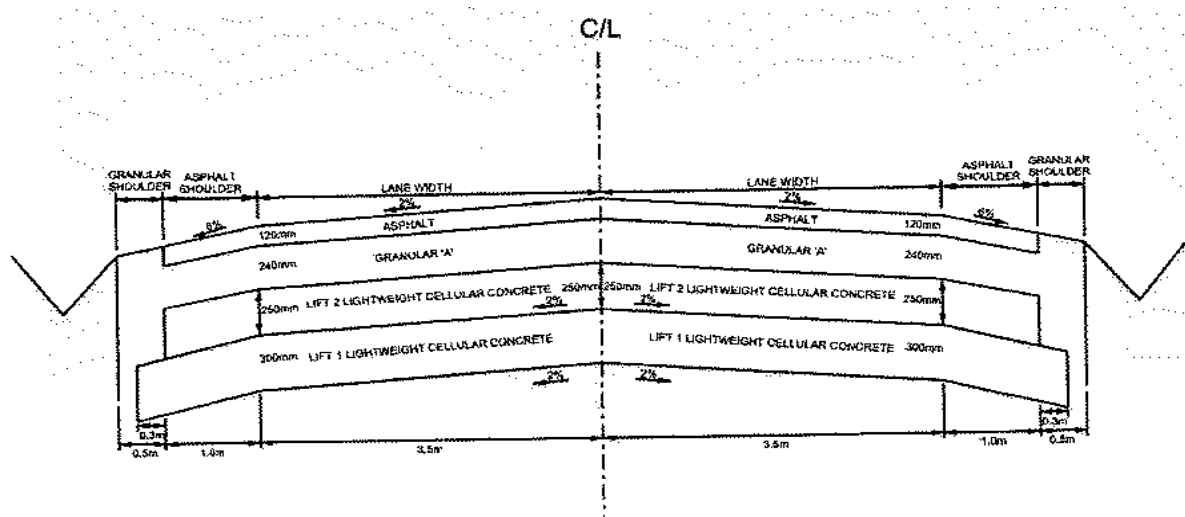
Pavement Structure. Winston Churchill Boulevard (CEMATRIX)
